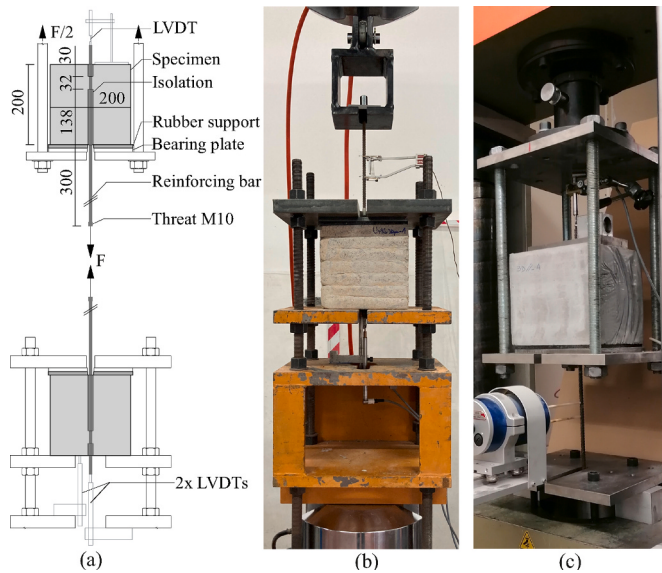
Testing set-up for the pull-out tests with reinforcing bars (dimensions in [mm]): (a) testing set-up schemes (top: ETHZ, bottom: UniNa); (b) image of the test set-up at ETHZ; (c) image of the test set-up at UniNa.
